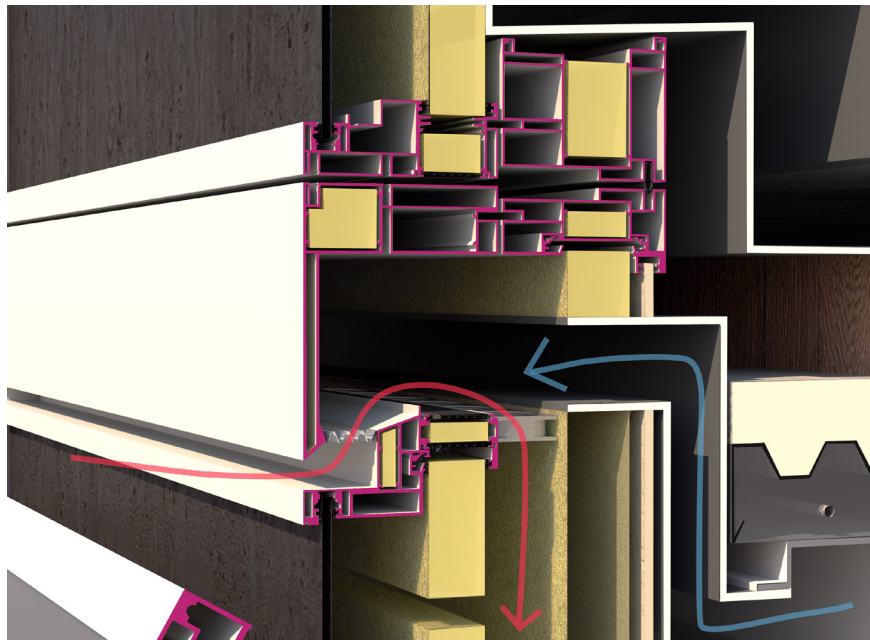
Section 1 vertical detail of connection between two TE facades and air movements in summer
